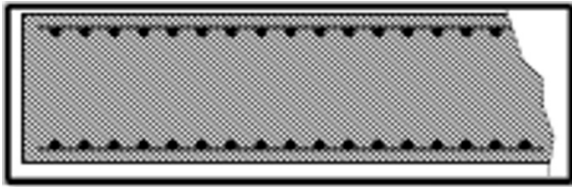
A schematic of suggested use of tungsten bandgap as reinforcement mat of Martian concrete [23]
